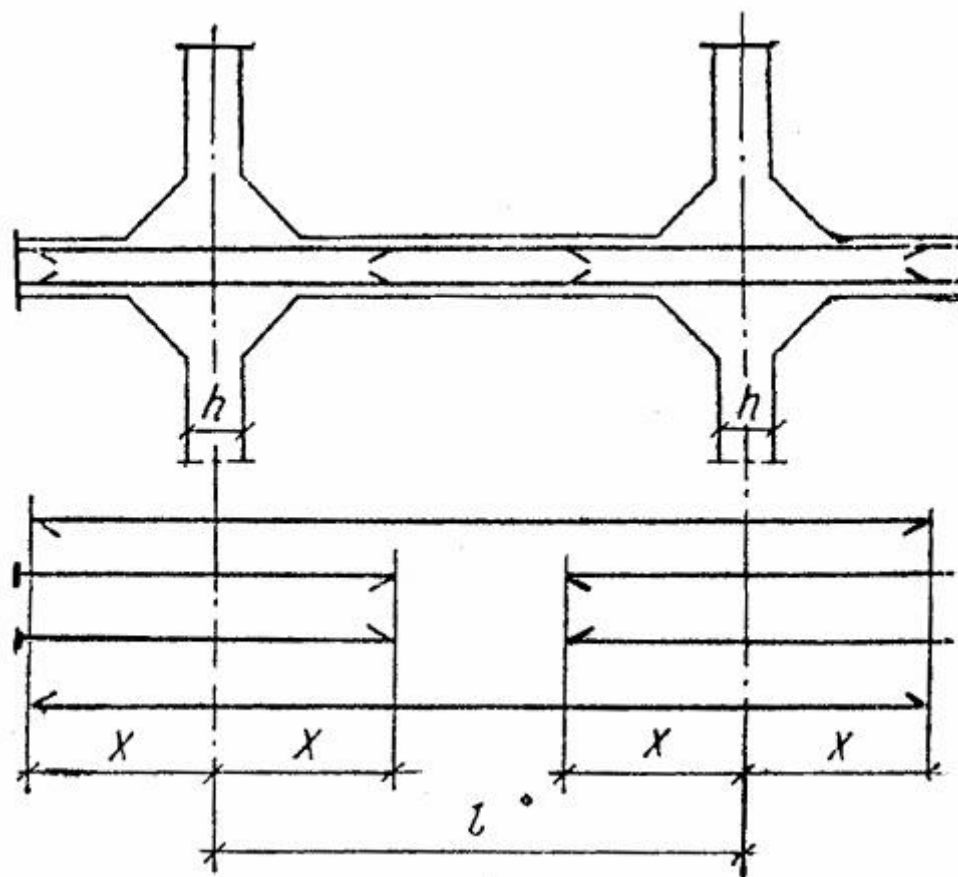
Reinforcement diagram for walls of square monolithic silos
